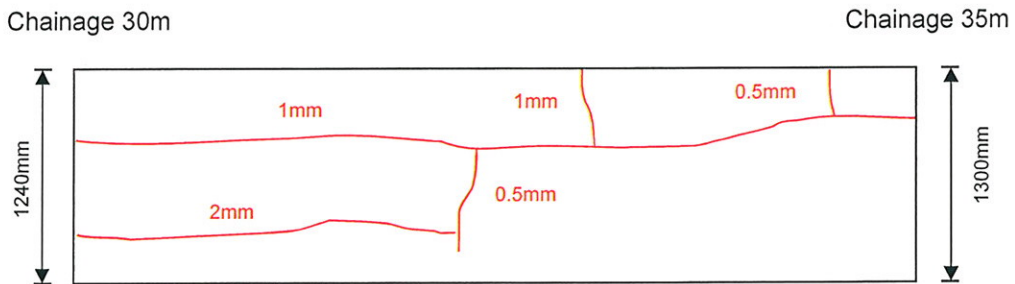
Wall Height, Crack Locations and Sizes for Chainages 30m to 35m
